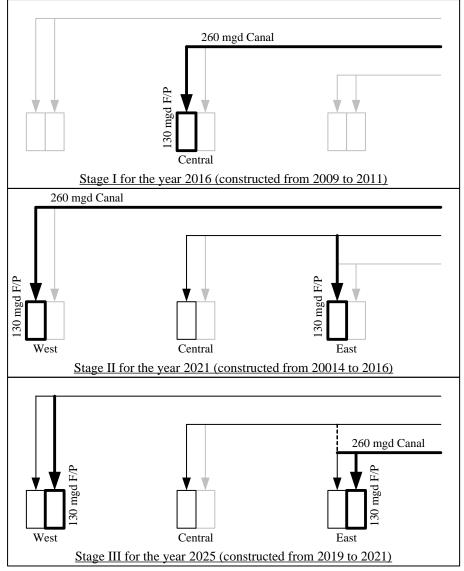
Proposed Arrangement between Canals and Filtration Plants constructed by K-IV Project
